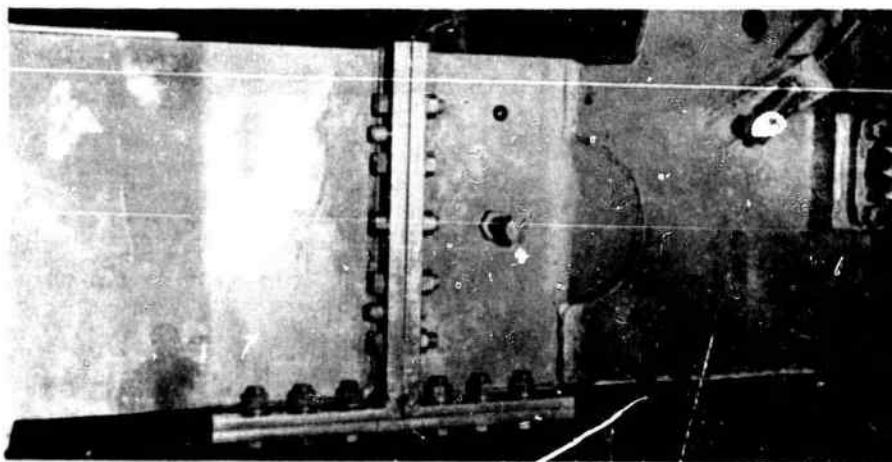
FINISHED JOINT (SECONDARY UNIT)
